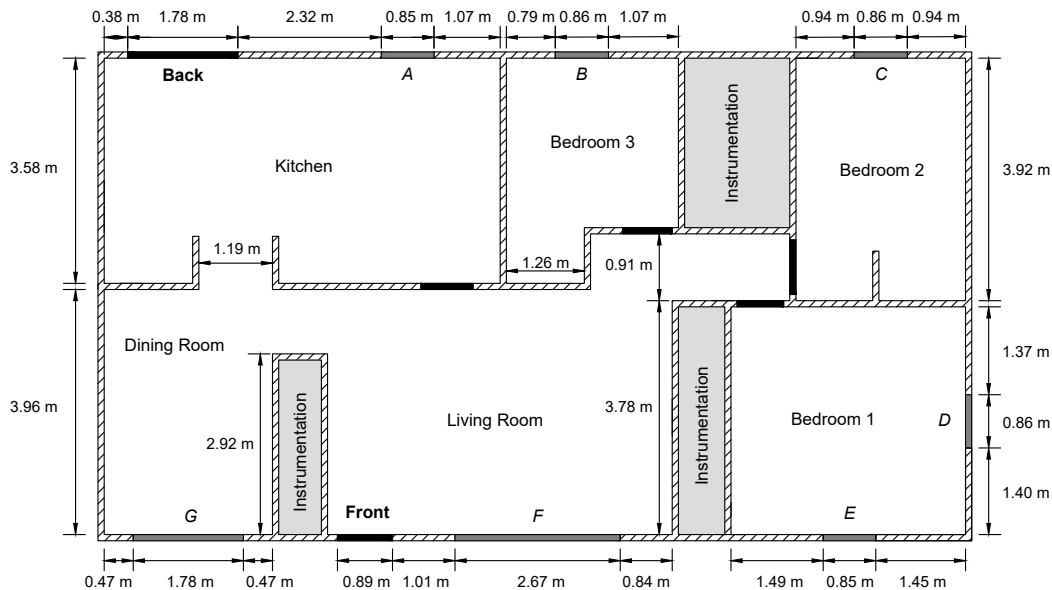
Dimensioned plan view drawing of the single-story structure
